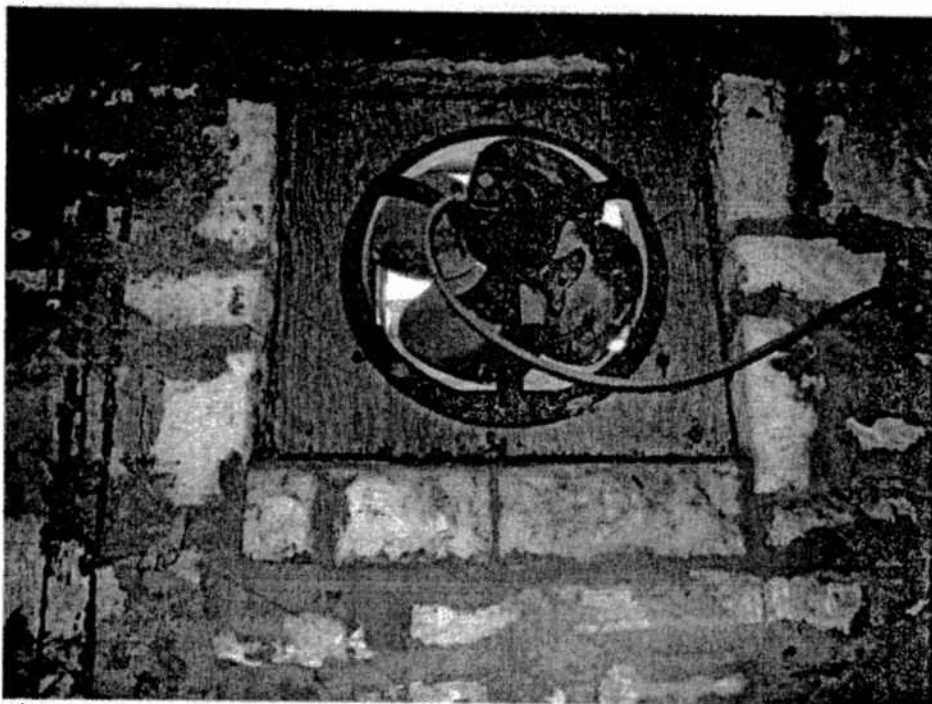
IFR vent fan located on the east-central IFR wall near the ceiling. Note the vent is not currently sealed to the outside.
